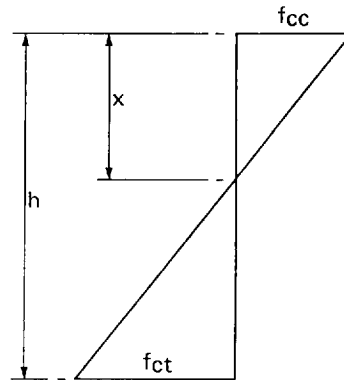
Section stresses used for the calculation of un-tensioned reinforcement.
